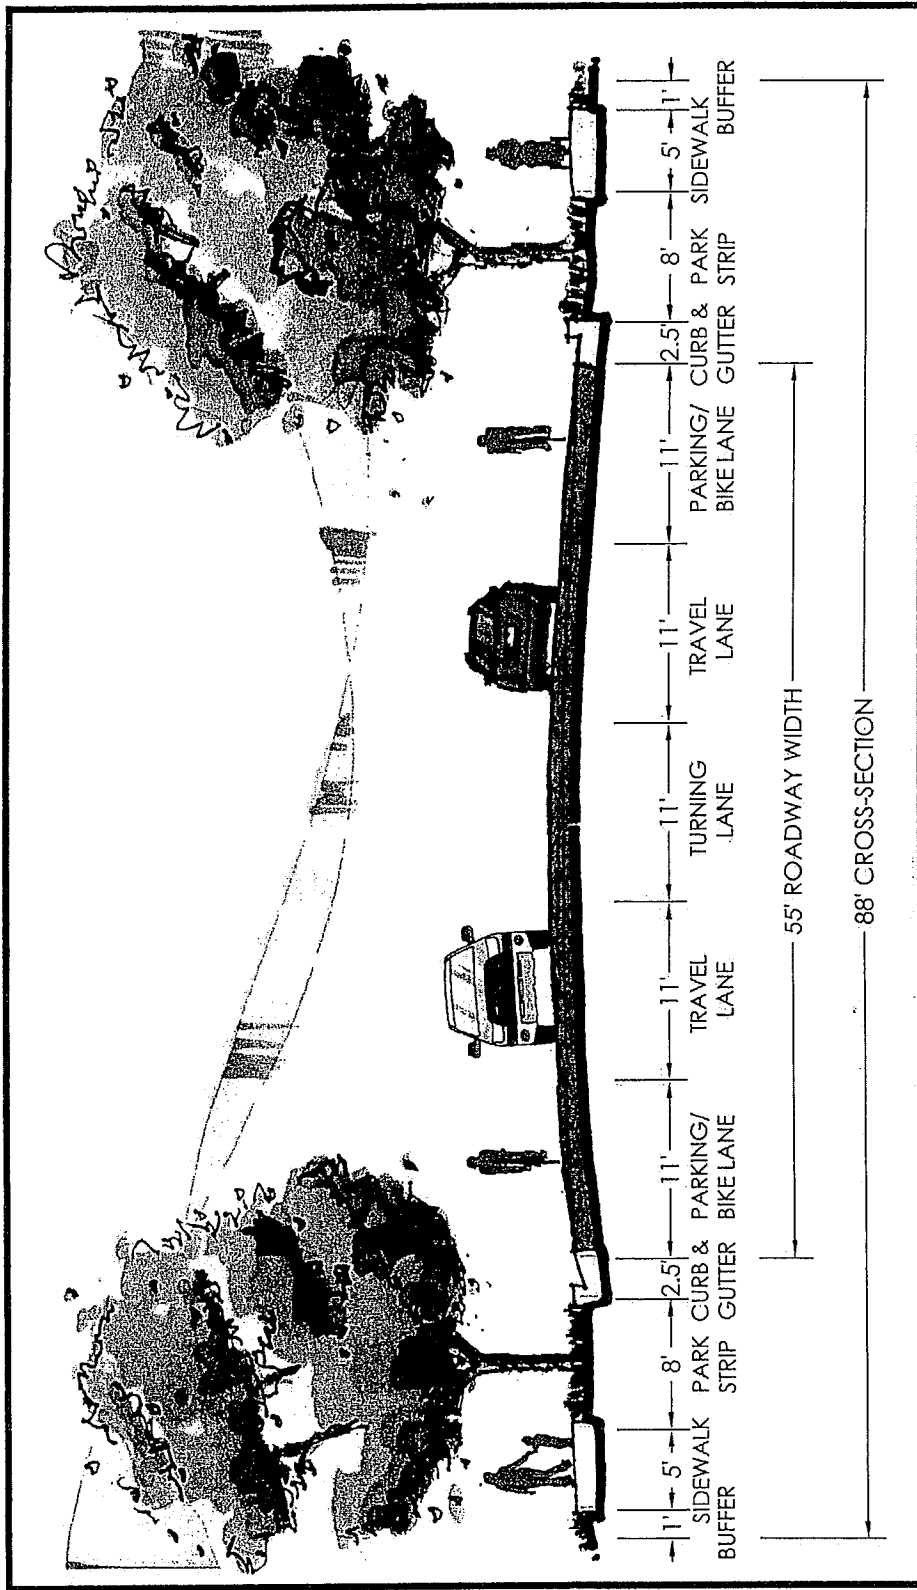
, Proposed Cross-section 200 South to 300 South
